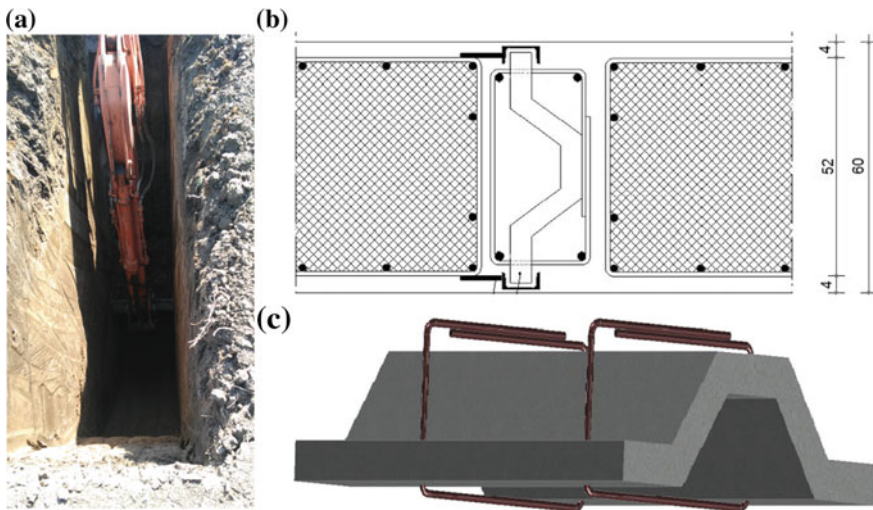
Newly-proposed technology for the diaphragm construction in cohesive soils: a narrow trench excavation; b joint of adjacent lamellas (view from above); c finishing sheet pile (Bonić et al. 2015a)
